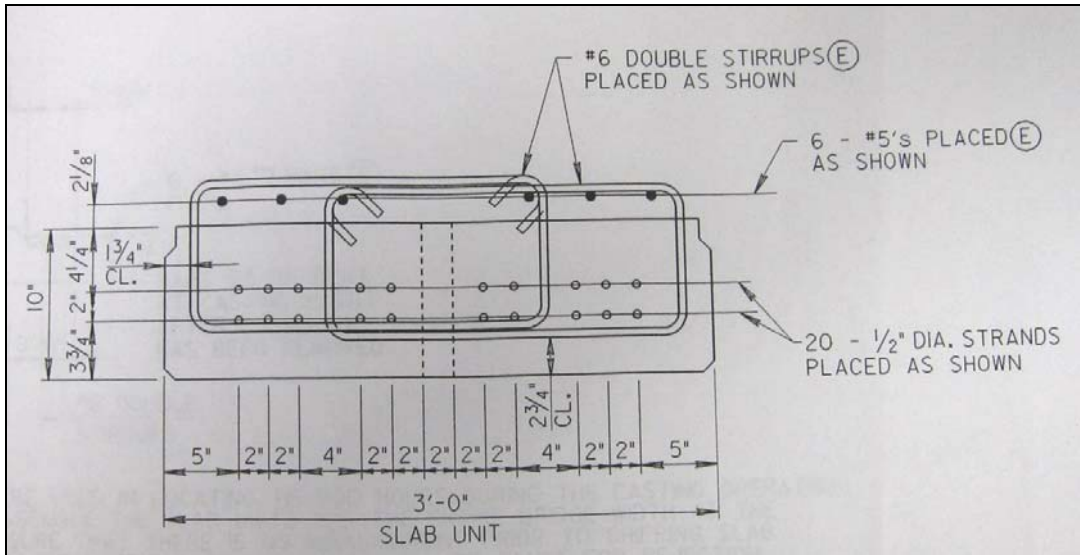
Structure No. 0901100 Wallace Creek Bridge (Slab Detail at End)
